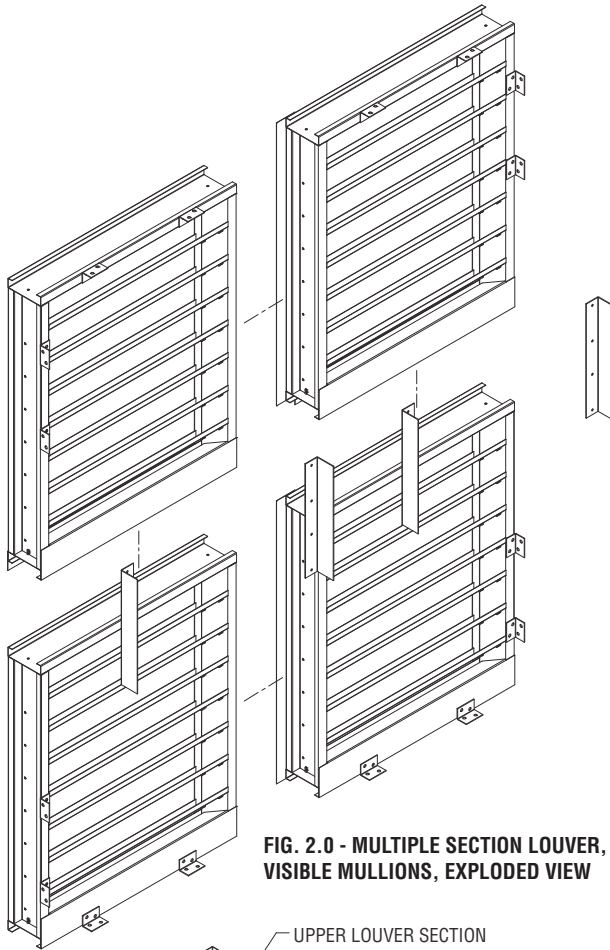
MULTIPLE SECTION LOUVER, VISIBLE MULLIONS, EXPLODED VIEW
